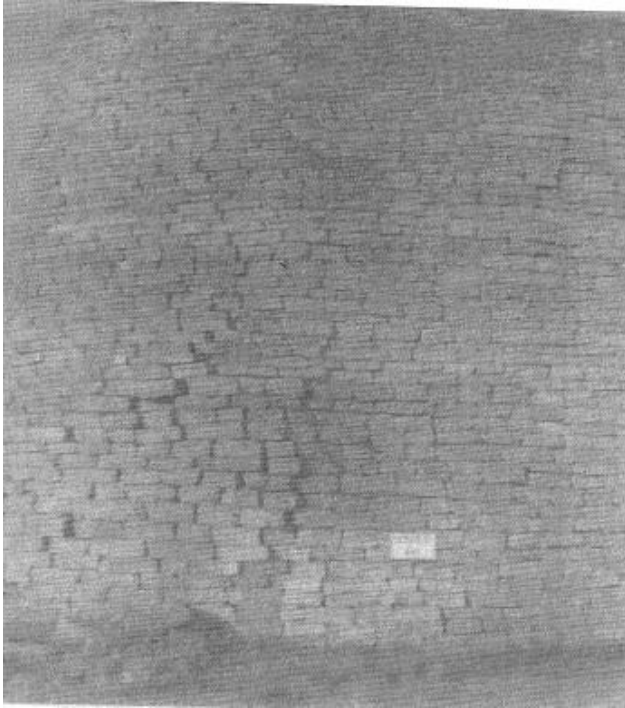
Western entrance wall, Great Enclosure of the Great Zimbabwe Museum. Stones are dry-stacked.
